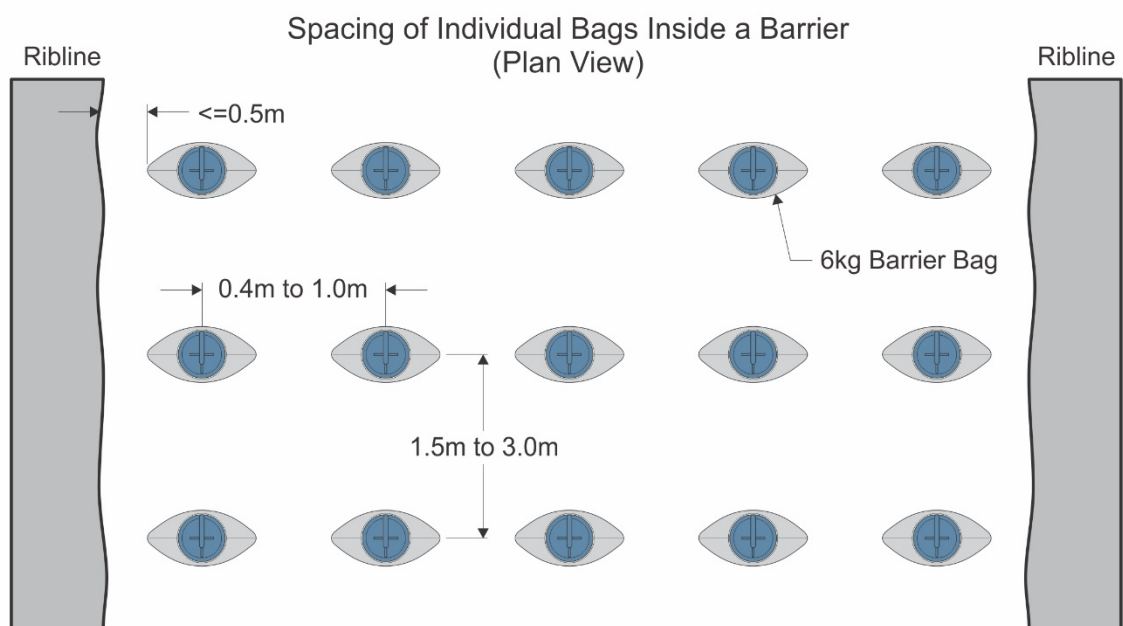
Typical bag placement in a roadway between 3.5 and 4.5 m high
